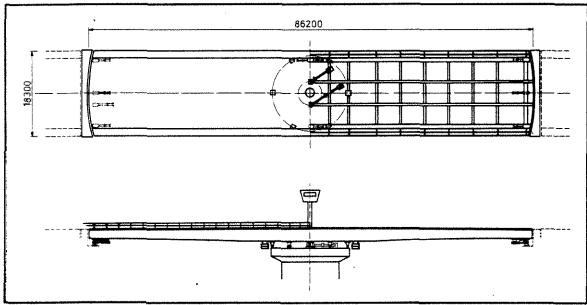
Shuaiba Maqal road bridge, general arrangement
